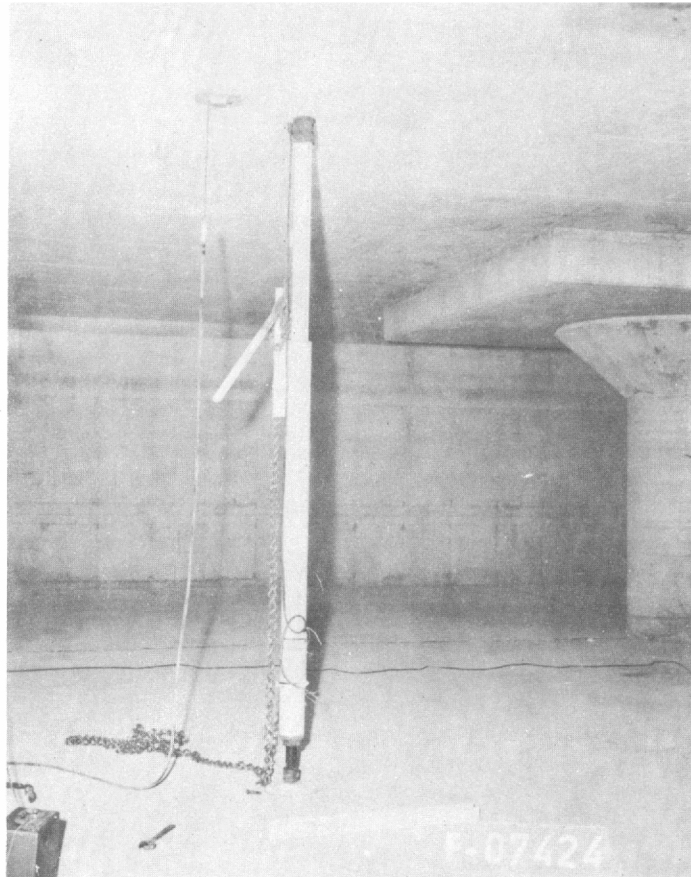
UNDERGROUND GARAGE INTERIOR.
